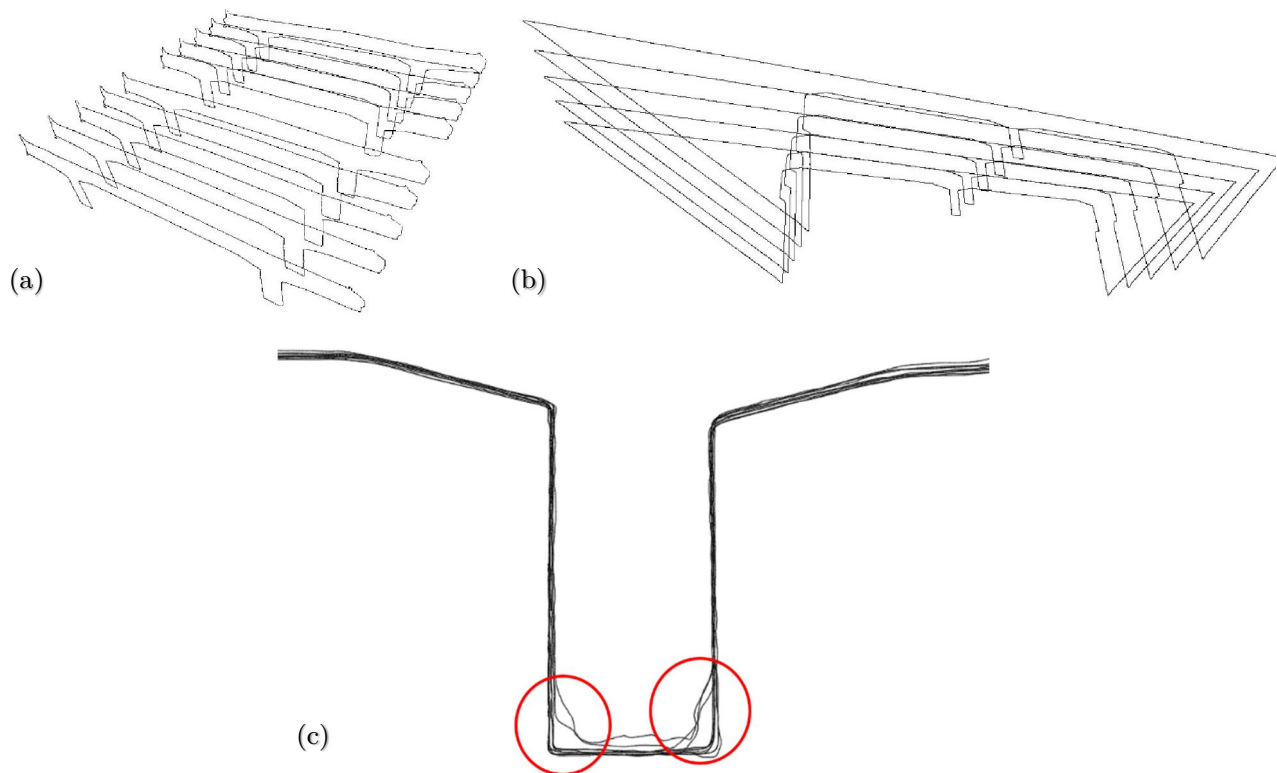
(a) Transversal bridge sections. (b) Longitudinal bridge sections. (c) Main girder equidistant cross section overlapped (missing cross section due to damage is circled in red).
